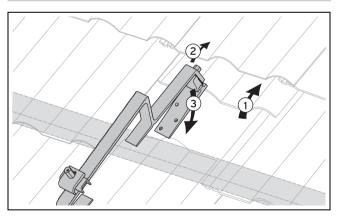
Exposing the roof batten and fitting the type P roof bracket
